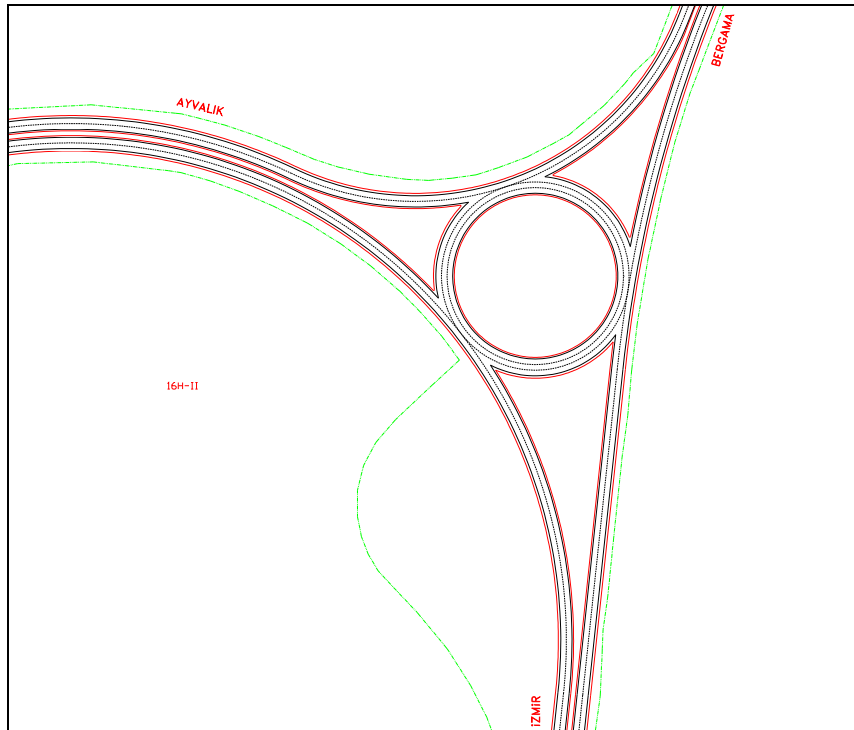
Proposed solution, three lanes weaving section, two lanes on bypass (alternative 3)
